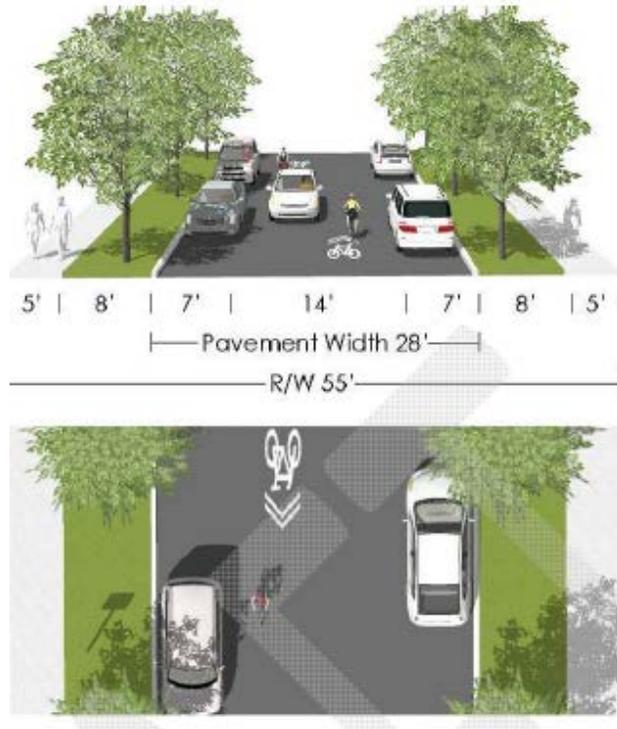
Proposed Minor Residential Street Cross-Section (Neighborhood Bikeway)
